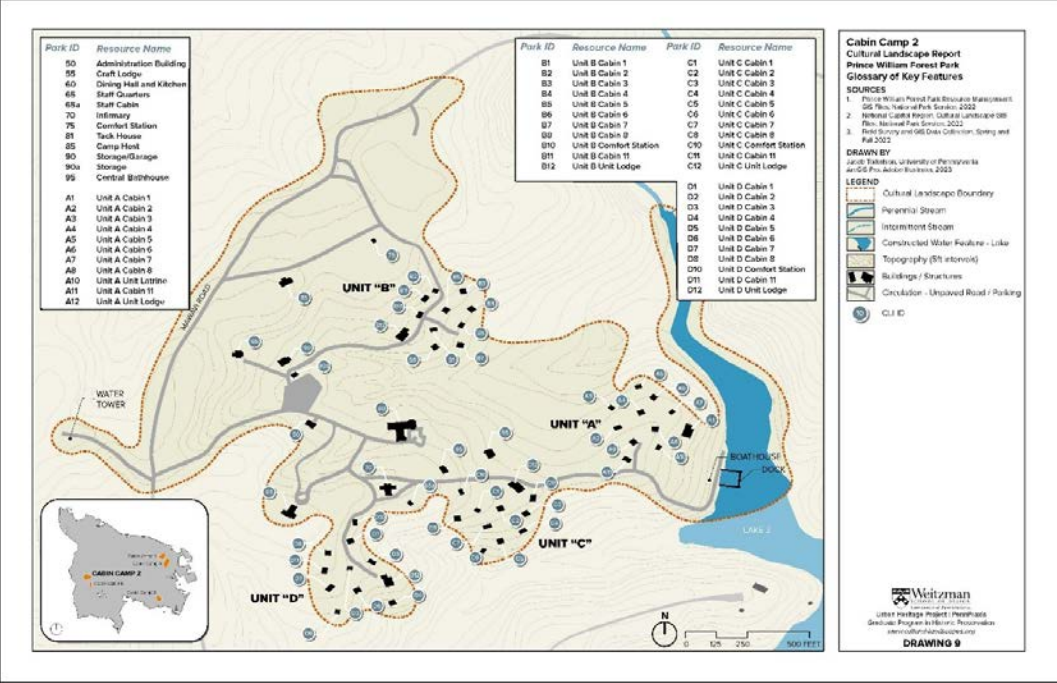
Existing conditions site plan showing the buildings and structures associated with Cabin Camp 2 (UPenn, 2023)
